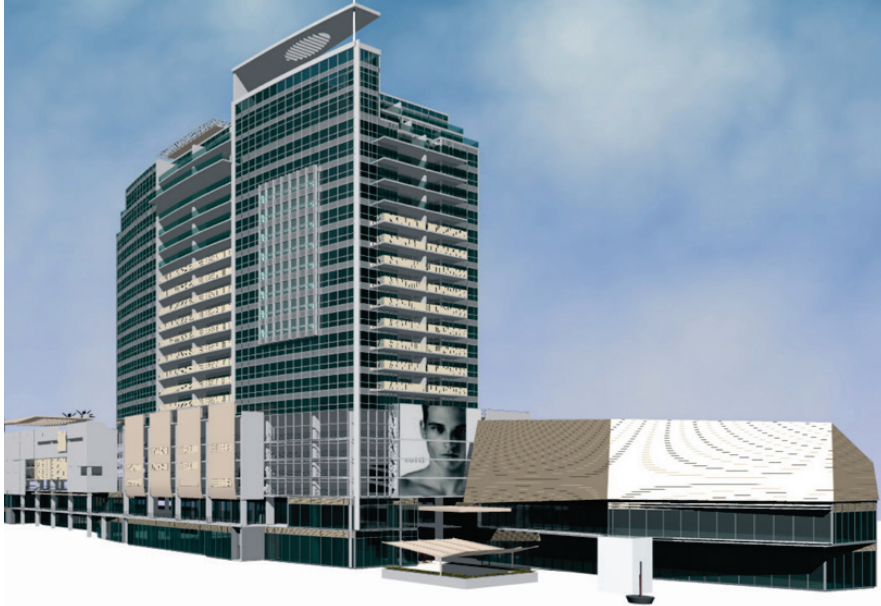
Hotel and convention complex. Meeting rooms, ballrooms, and exhibit spaces located above the tsunami inundation elevation can be used to provide areas of refuge.
